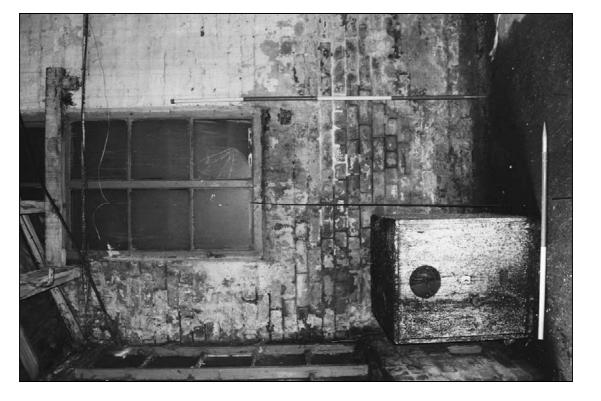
Detail of truncated and blocked window, west wall of G3, west range extension (film 21.7)
